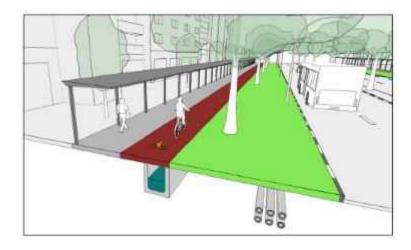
Widened footpath 2.4m (minimum) with covered linkway columns near development side
